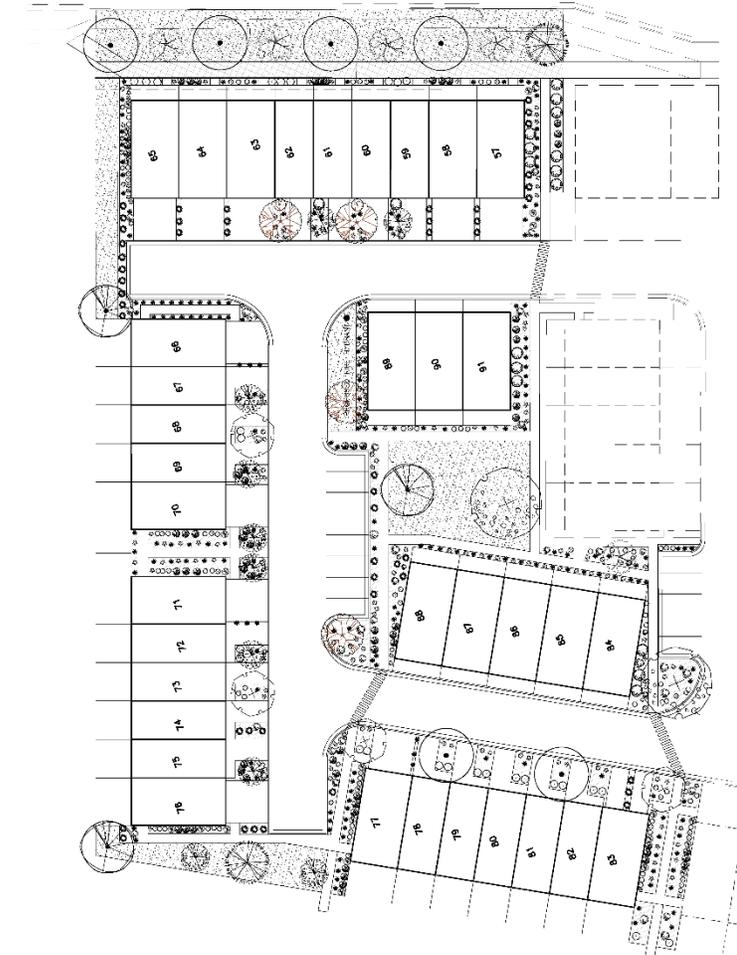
" LANDSCAPE & SITE PLANS
